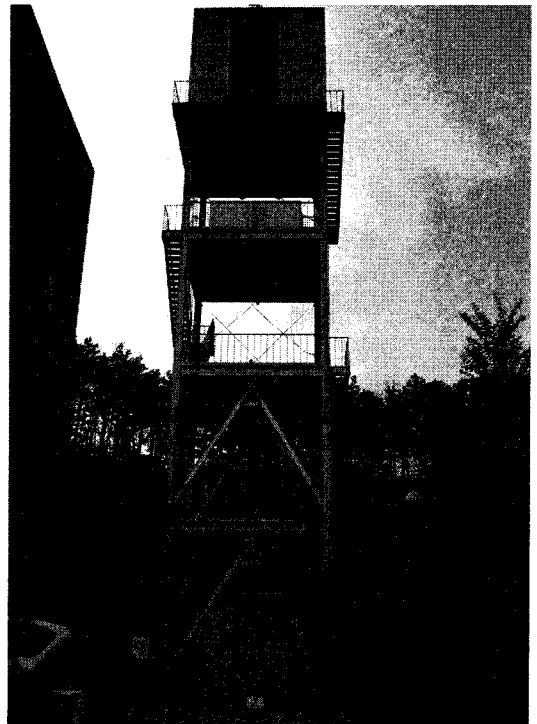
A full-scale five-story steel structure (UNISON. CO.)
